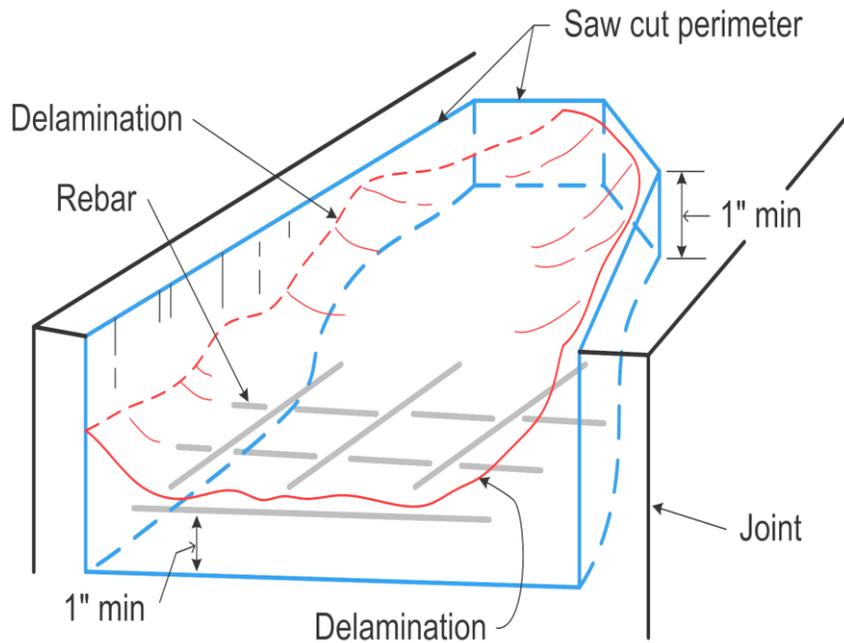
A schematic of the proper method for concrete preparation for a concrete spall repair.
